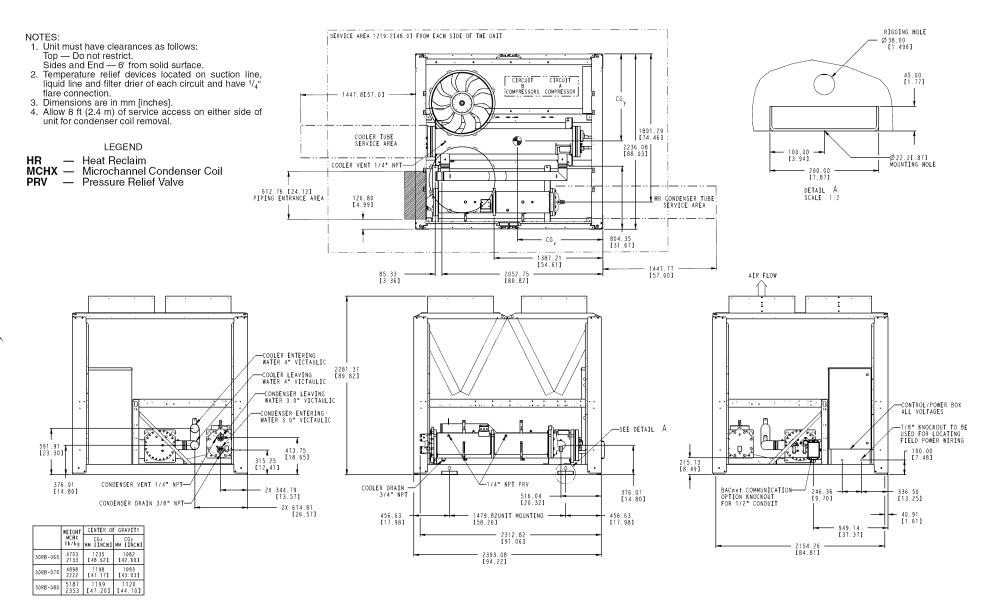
30RB060-080 Air-Cooled Chiller with Heat Reclaim Option Dimensions
